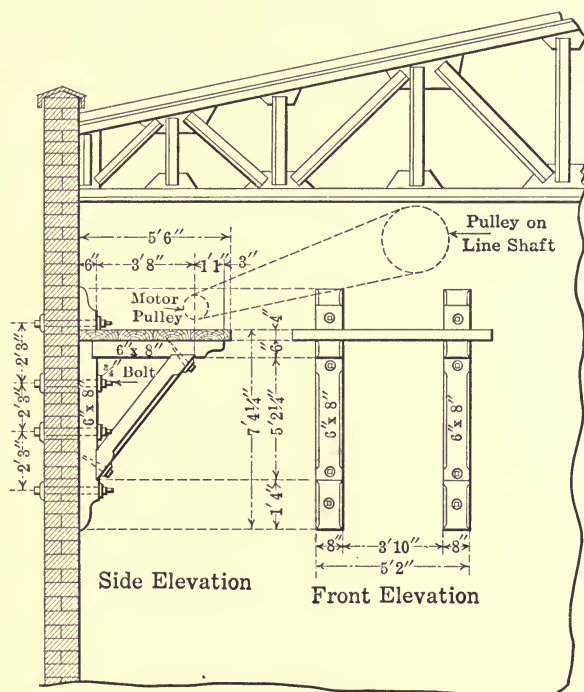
WOODEN WALL BRACKETS FOR MOTORS.
